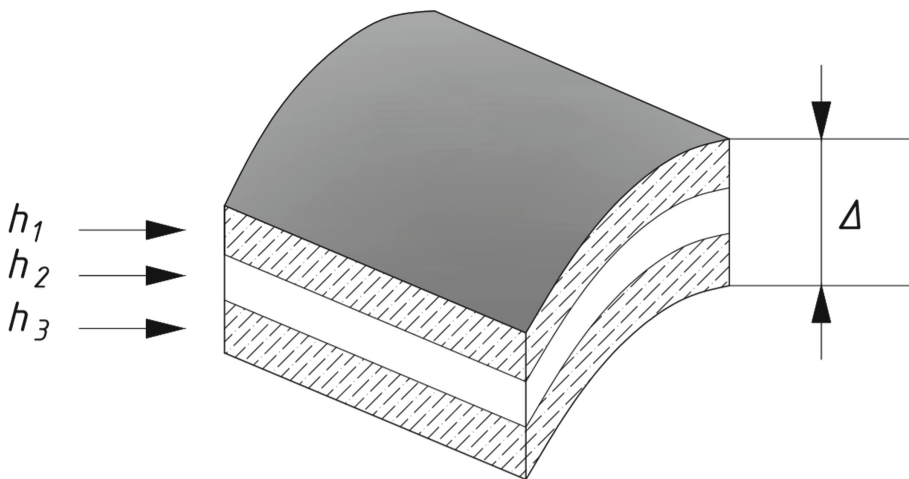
Open Shell Segment with Layers. $h_{1,3}$ is concrete layer thickness. h_2 is connecting structure (reinforcement) thickness. *Source:* developed and compiled by the authors
